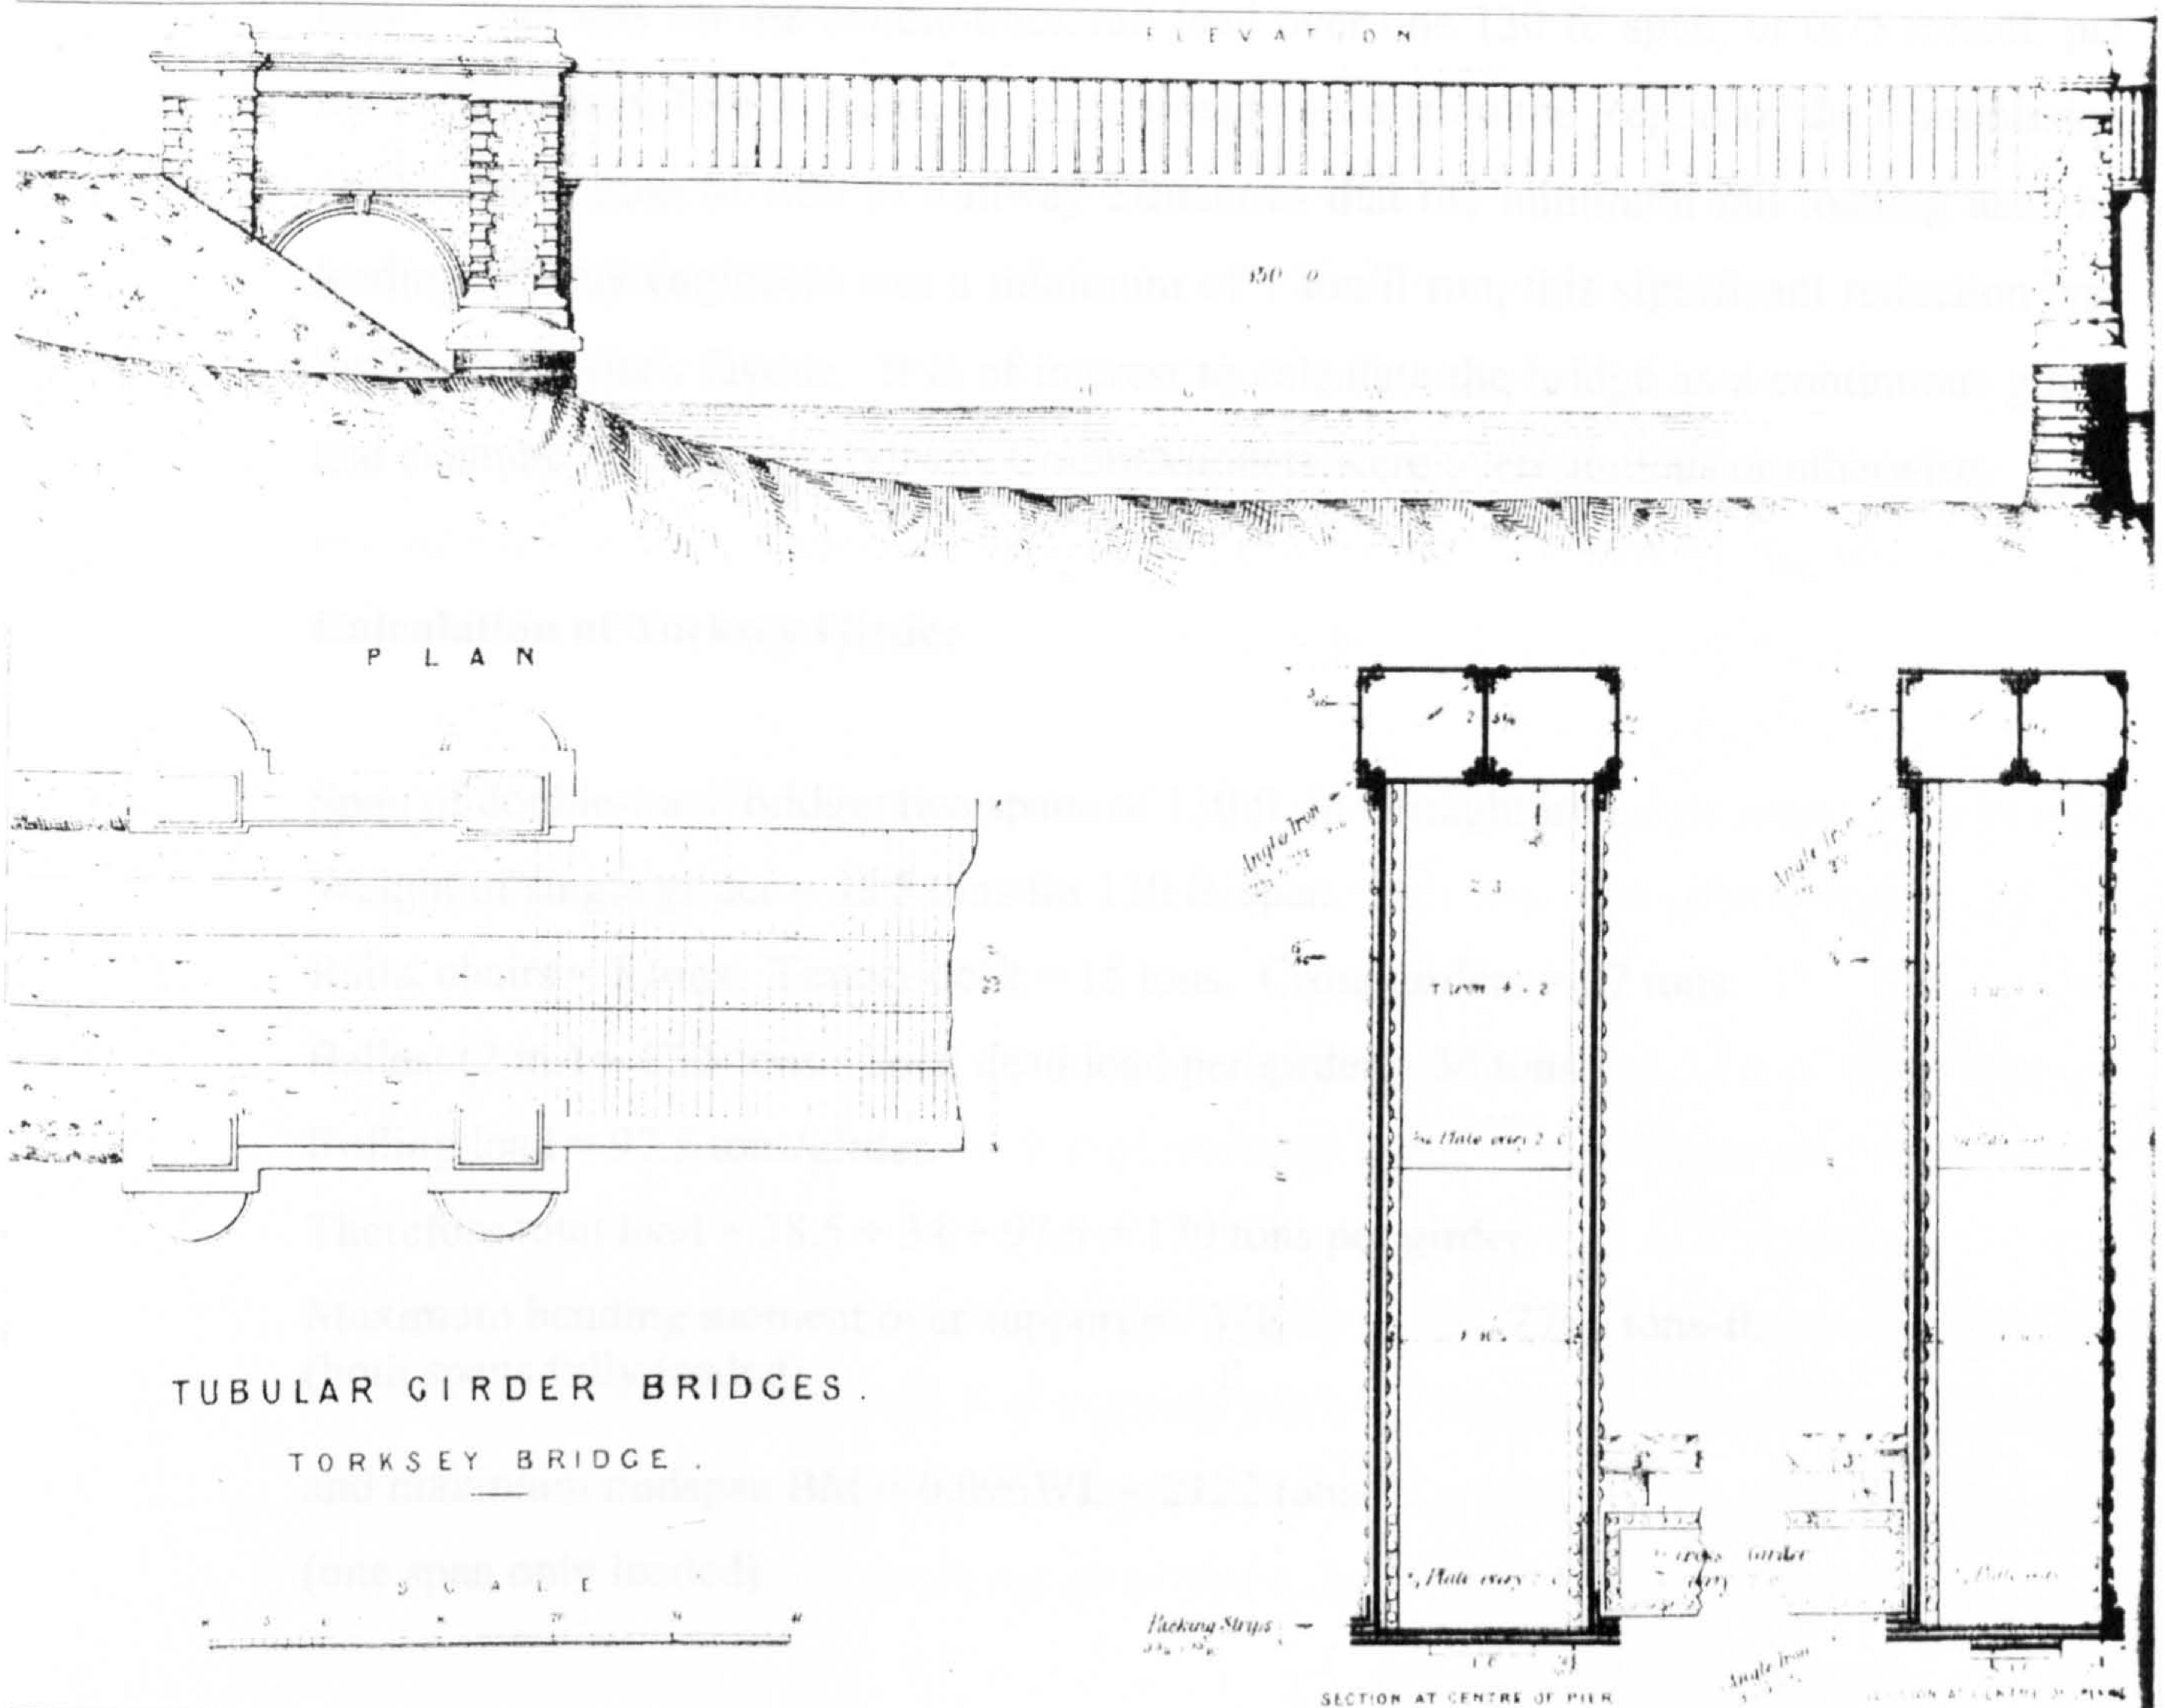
Torksey Bridge. Typical Fairbairn box girder. Two spans of 135 ft. 1850.
